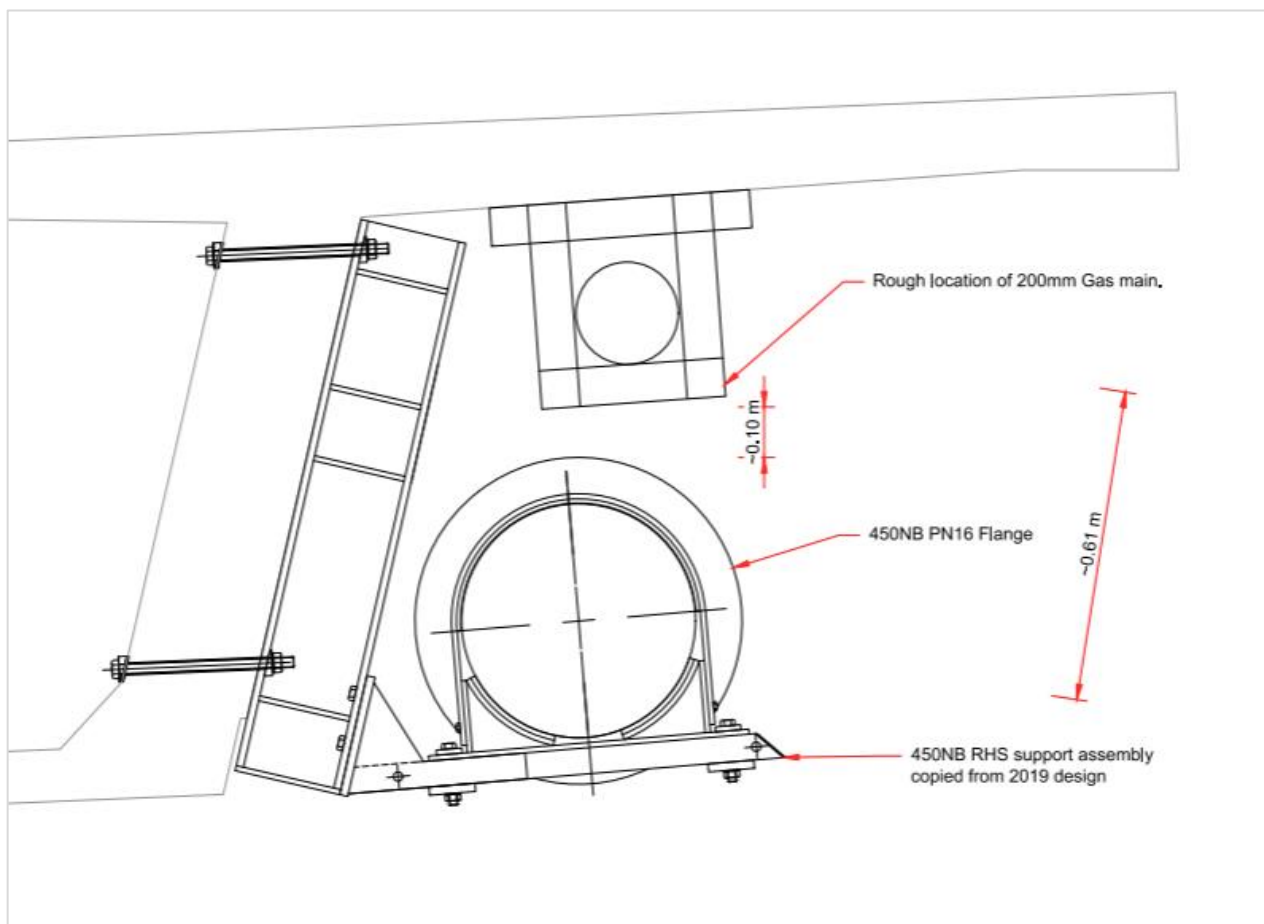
Sketch of Potential Services Arrangement on Upstream End of Shotover River Bridge (Dimensions Indicative Only)
